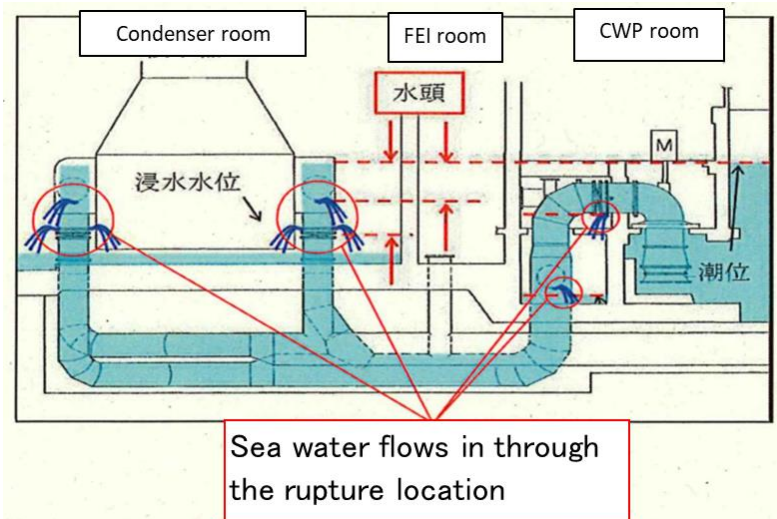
Locations Where Flooding Is Assumed in the Event of Expansion Joint Failure
